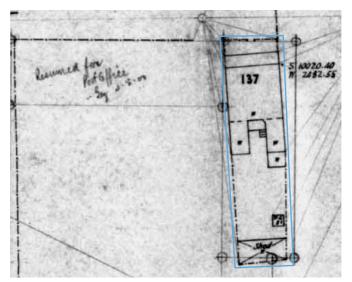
Detail from 1886 plan of northern block (William Henry St to Macarthur St) of current Powerhouse Museum site, depicting the house at 137 William Henry Street. (Source: Sydney Water PWDS 1544-S206)
